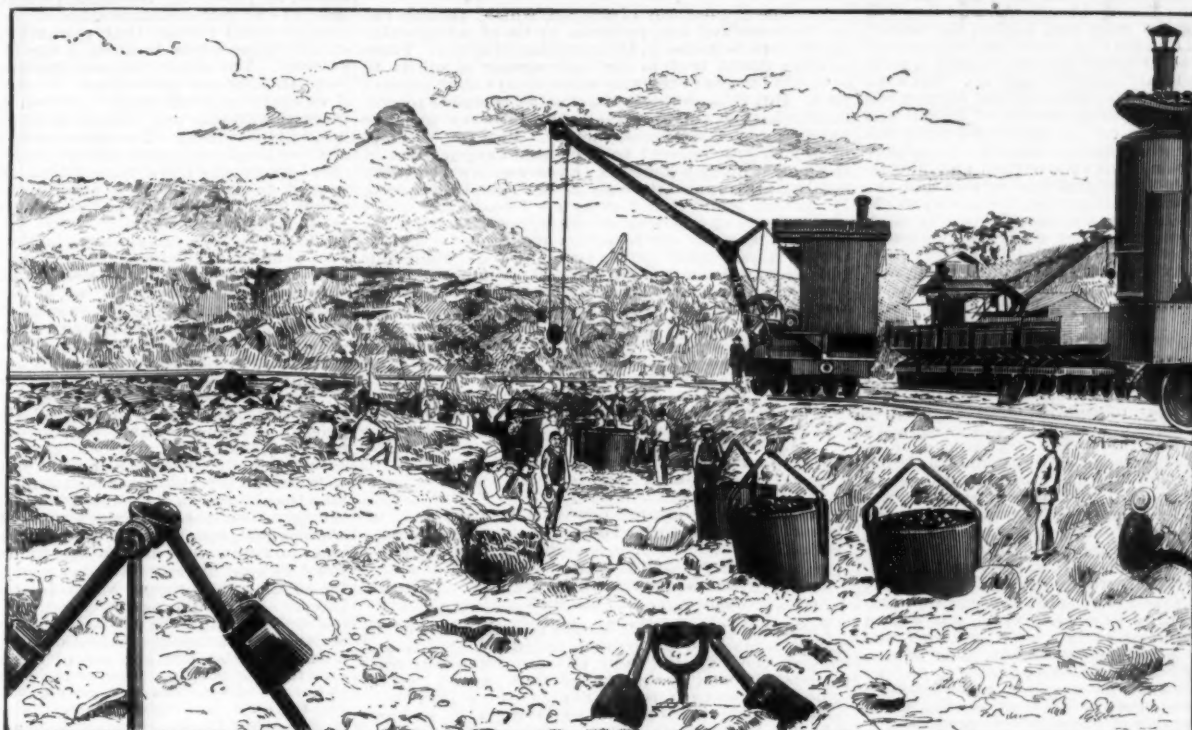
ROCK CUT SHOWING SYSTEM OF CHURN DRILLS AND CRANE BUCKETS.
